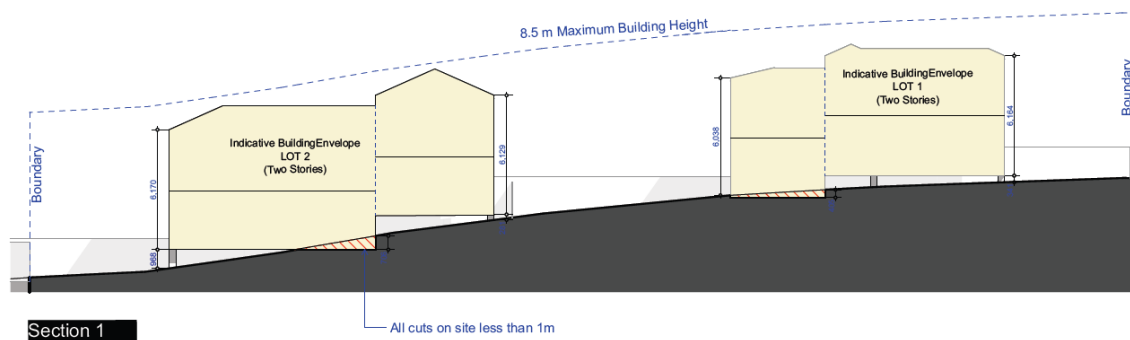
Extract of Indicative Building Envelope (DA-005) plan (2)
